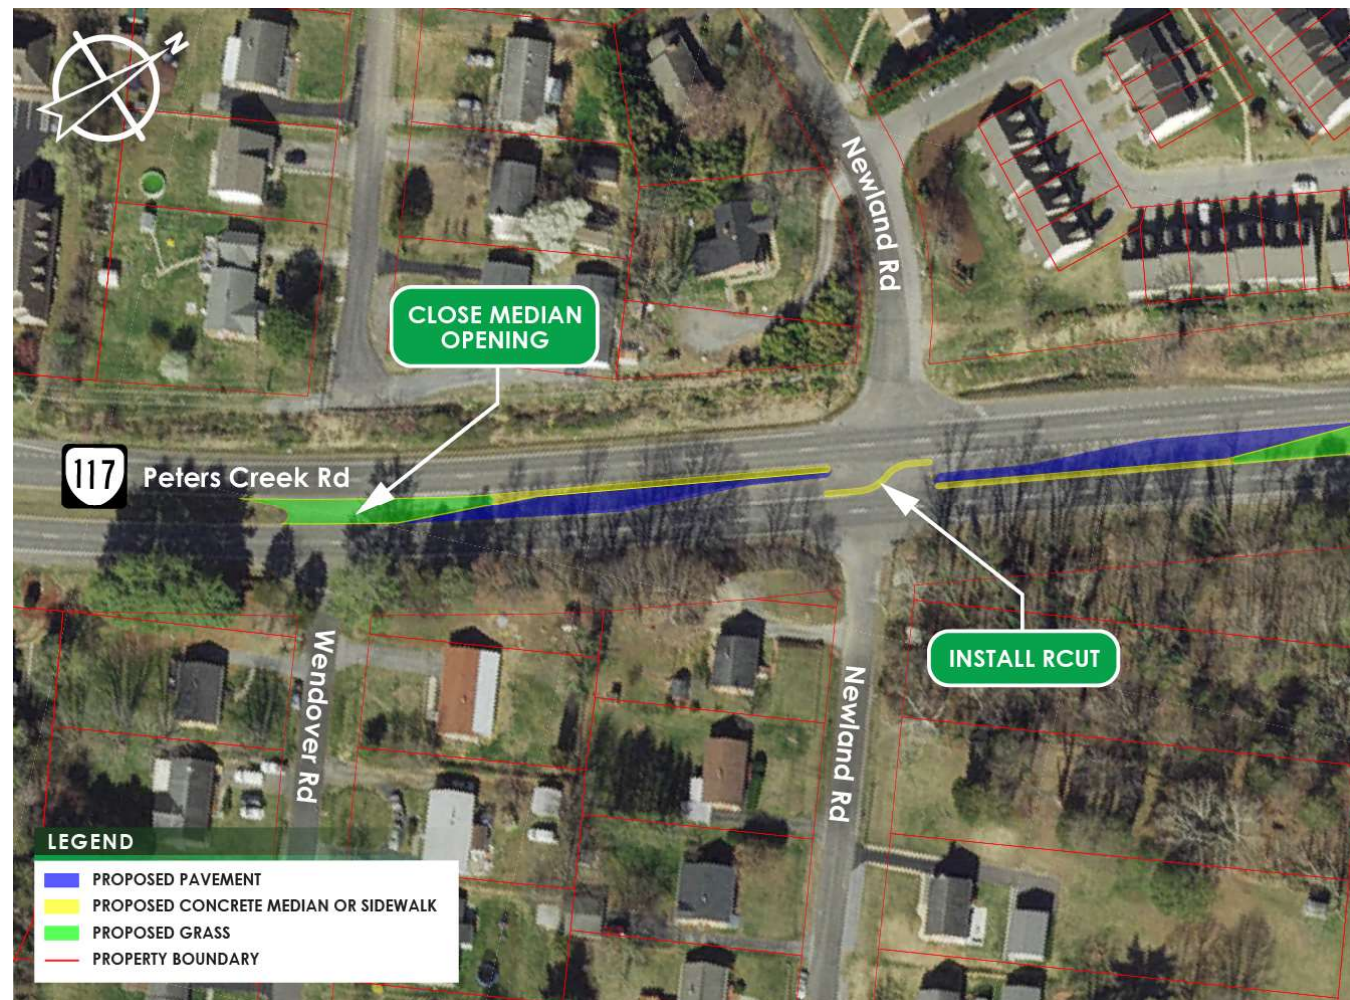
Peters Creek Road at Wendover Road & Newland Road
